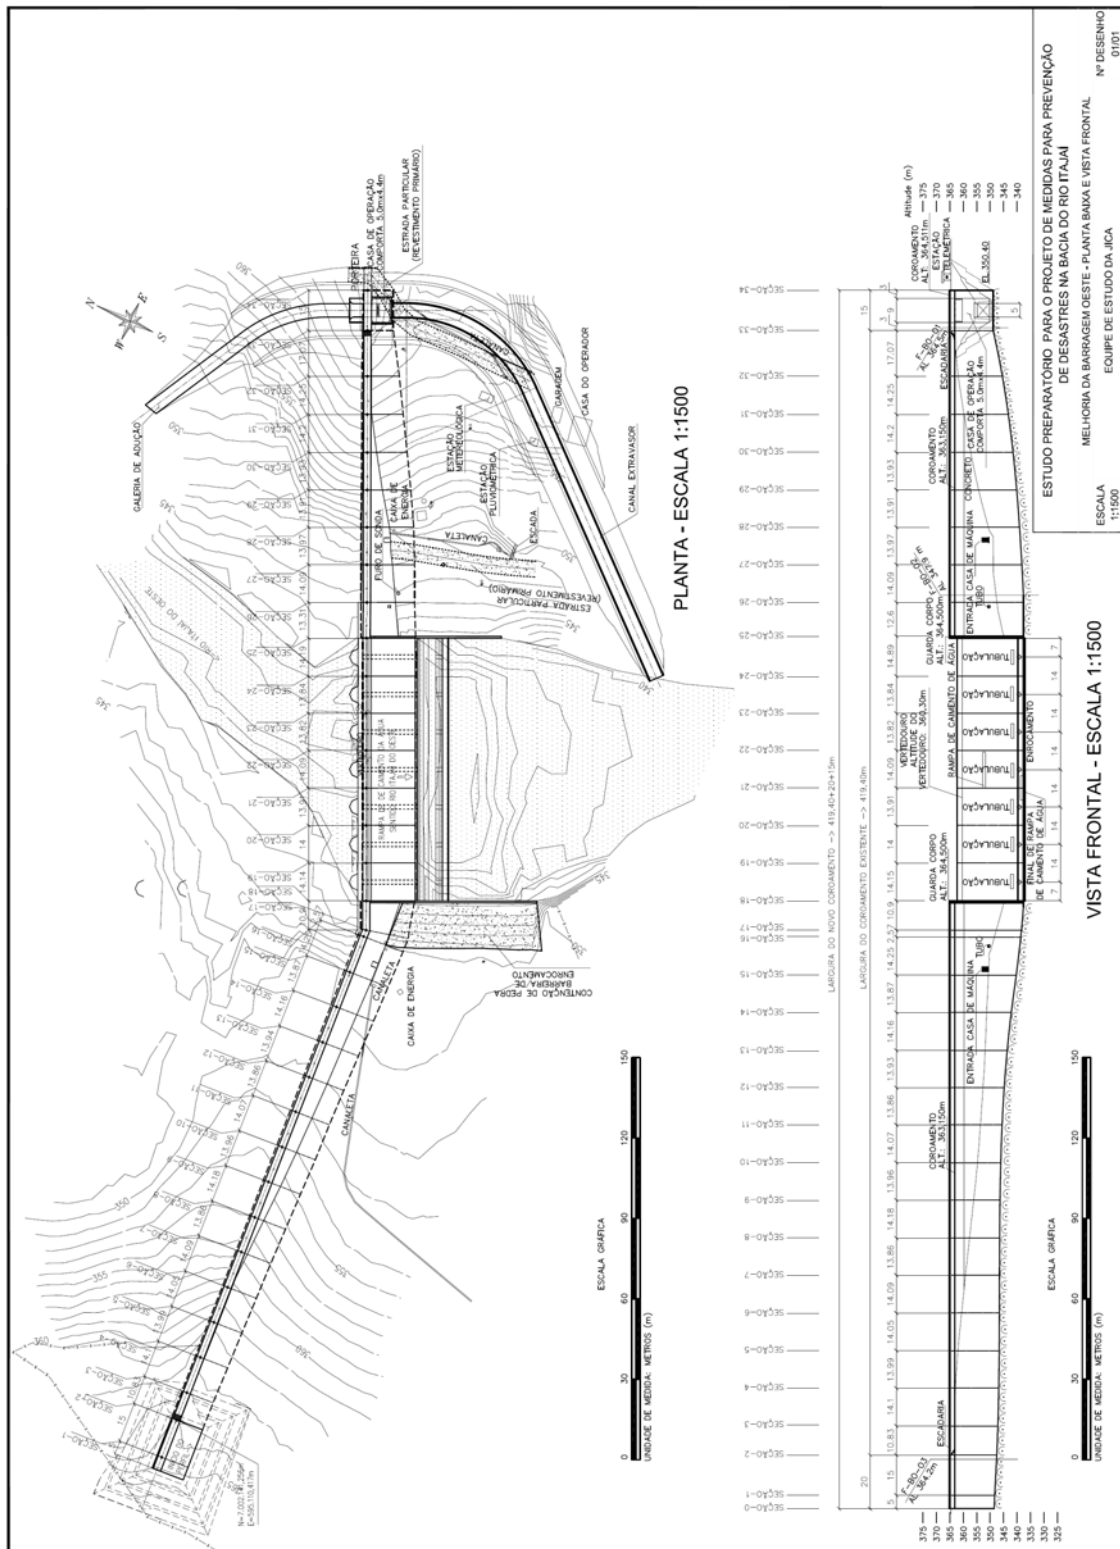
Heigtening of the Oeste Dam and Additional Conduit (1/2)
